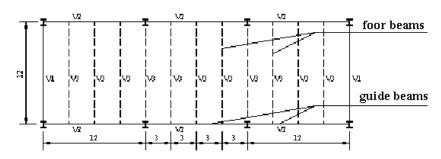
Schematic view of floor structural arrangement – configuration 02 (measures in m)
